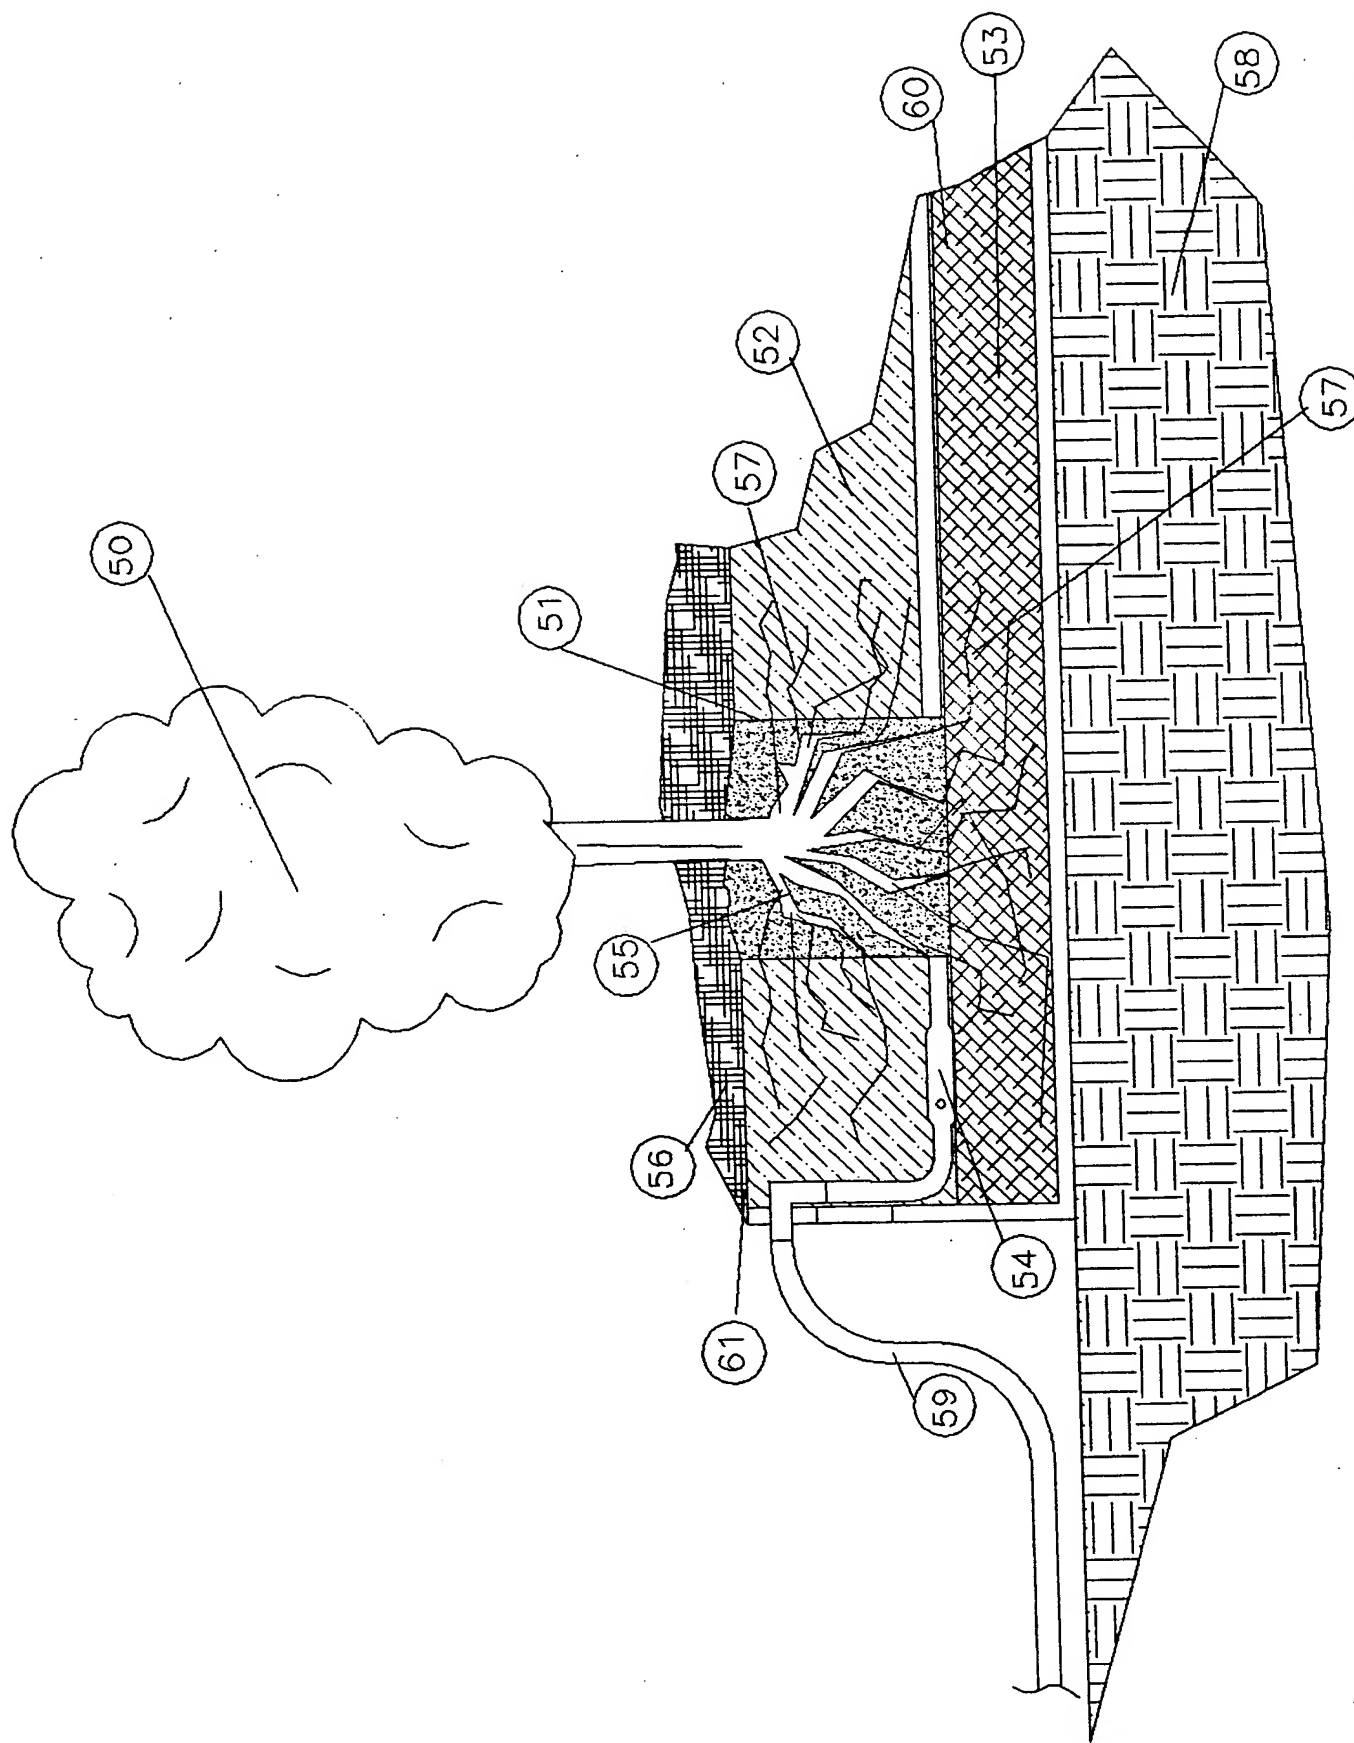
SCHEMATIC, CROSS SECTIONAL VIEW OF AN ENGINEERED IRRIGATION LANDSCAPE PANEL WITH PLANT MATERIAL PLANTED AND GROWING
